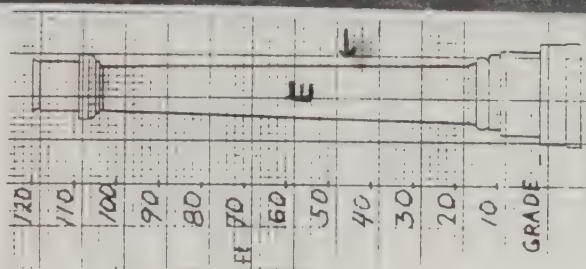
Photo Astoria Column East Face Section OCT 1989
